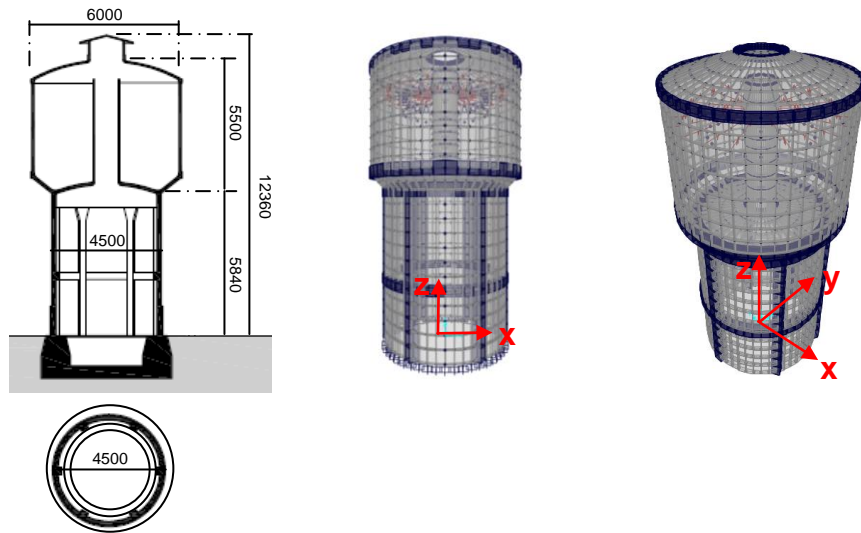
Cross section, base plan (dimensions in millimeters) and finite element model views of the water tower
